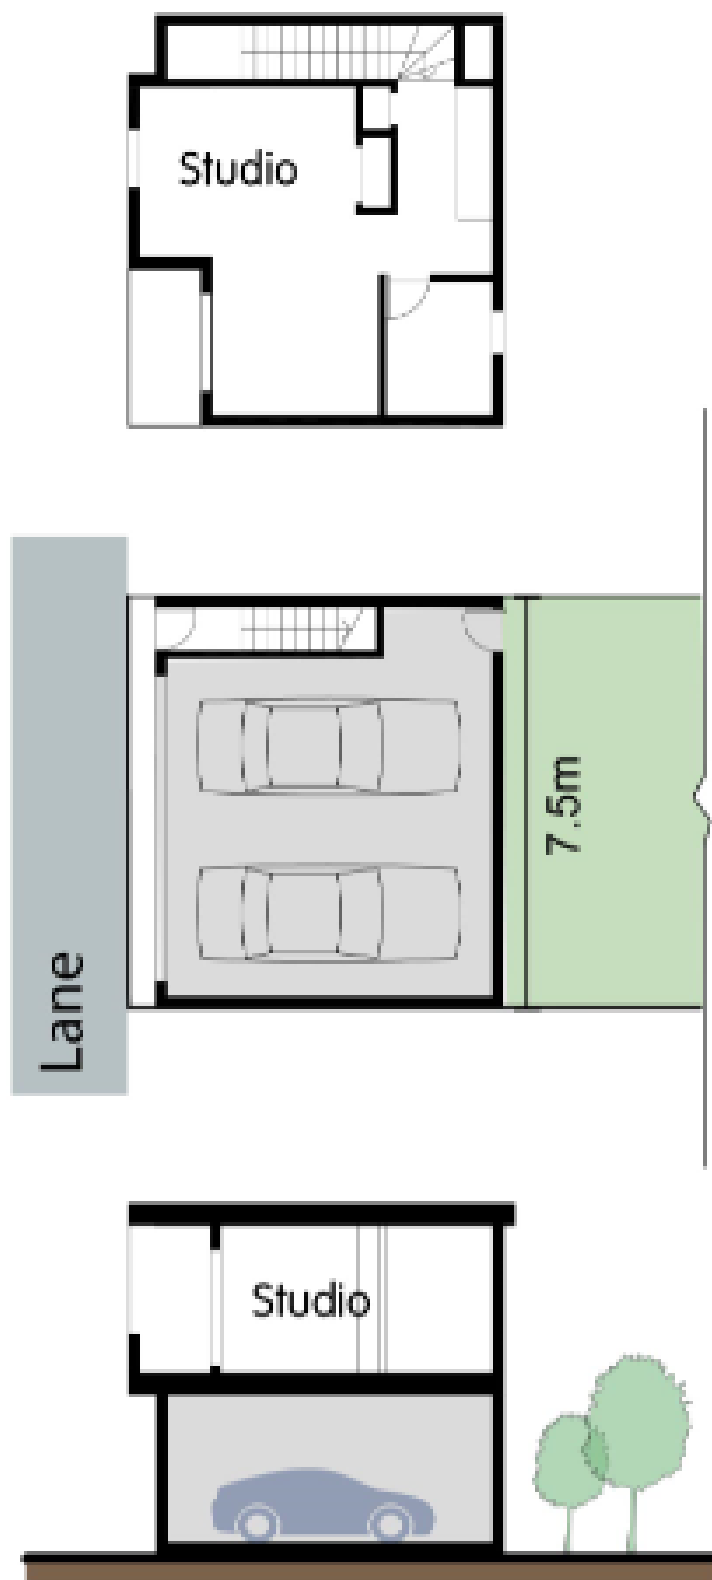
Typical Studio Dwelling Typology with Two Parking for Terrace Only
